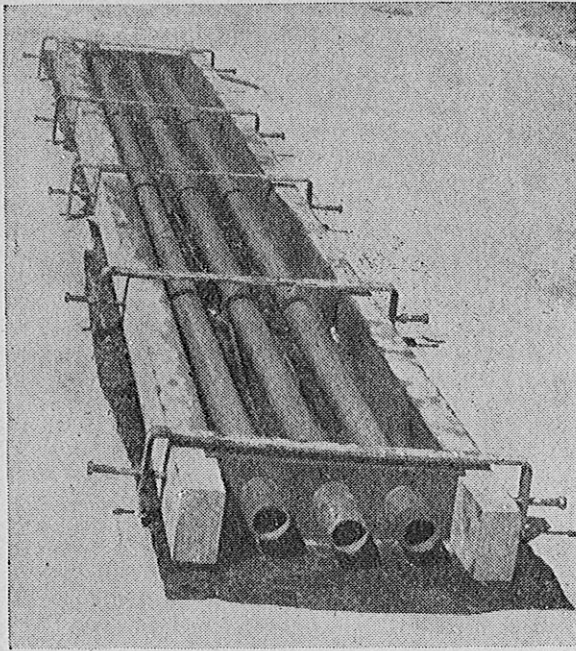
Showing the mould for casting the slabs. Galvanized iron pipes were used to form the hollows
